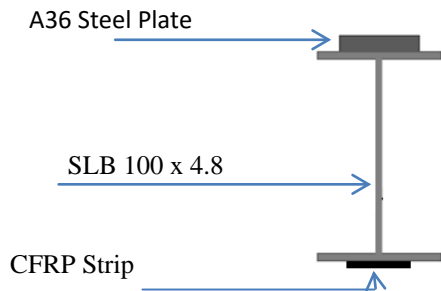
Section Details of Kirk Beam (Kirk, 2009).
